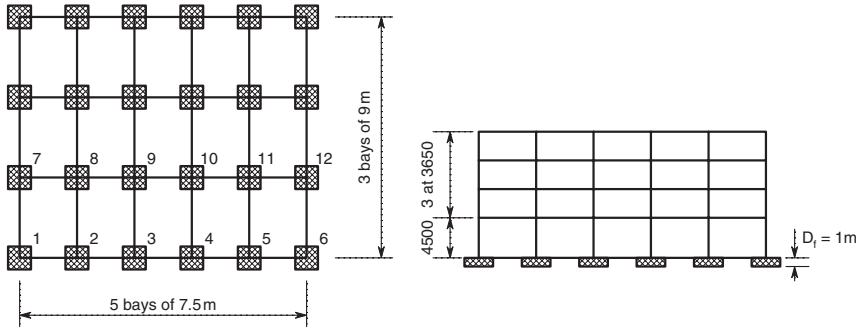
Three-storey structure elevation, plan and footing numbering
